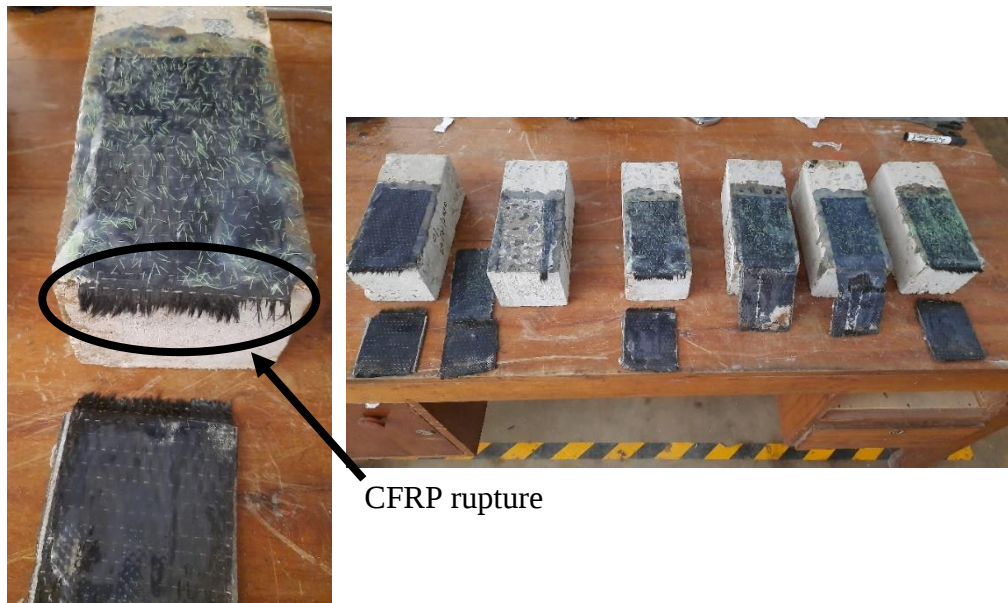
(a) CFRP rupture at the gap between steel plate grip and concrete block (b) Failure modes of samples
